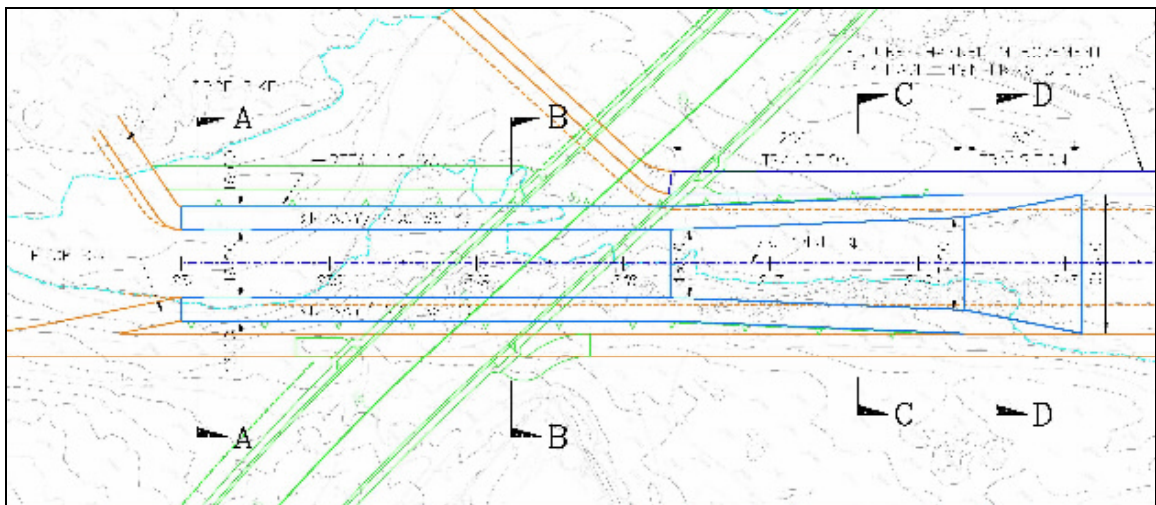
Conceptual Amargosa Creek Upstream Channel Improvement at Proposed 20<sup>th</sup> Street Bridge
